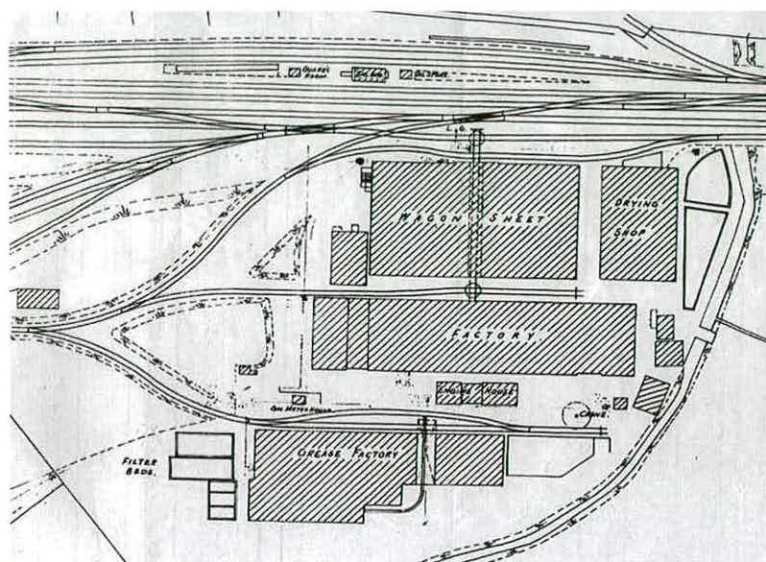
Romford Factory, 1922 block plan ( Railtrack plc).
